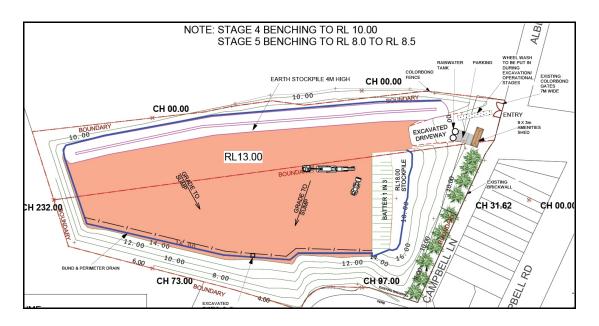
Extract from the plan of Stage 3. Full details are provided on Drawing No.19, Issue E of the plans of the proposed development at Appendix 9.
